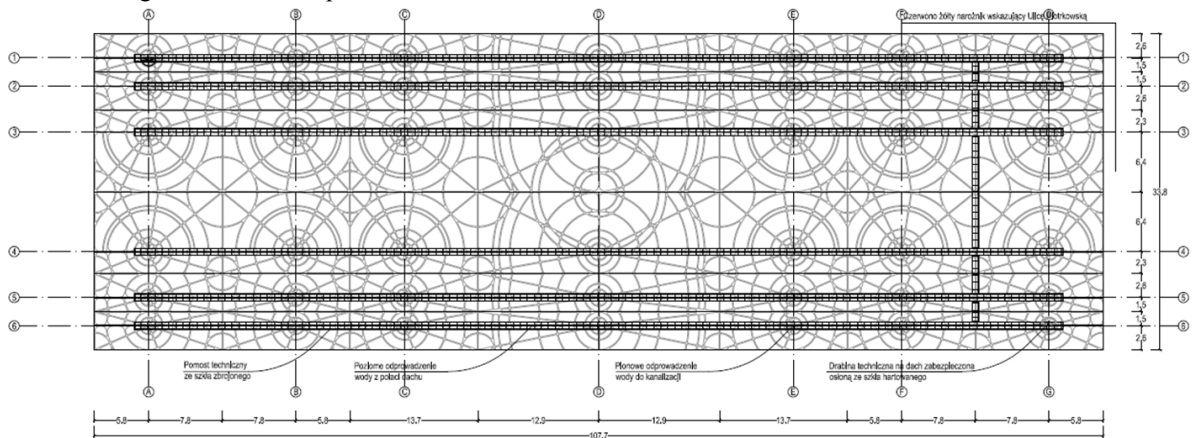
Patterns of roof panels divisions (from the Architectural Concept stage). [1]
